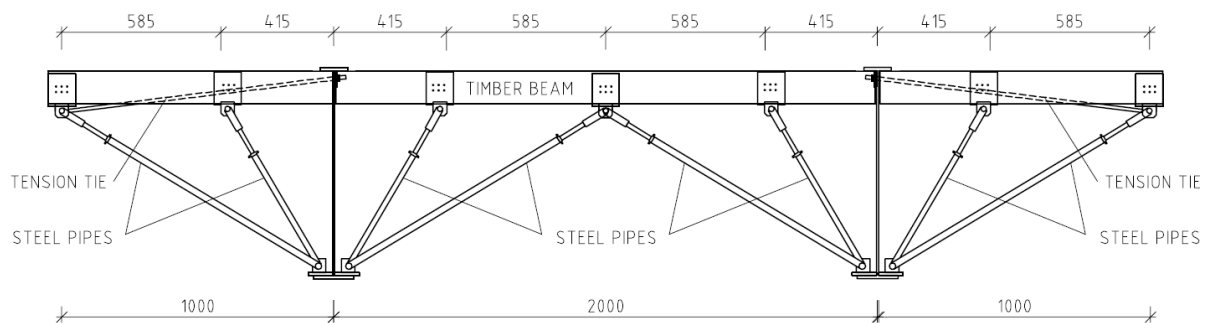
Cross section of set-up with complete formwork attached (BRITEK Ltd)
